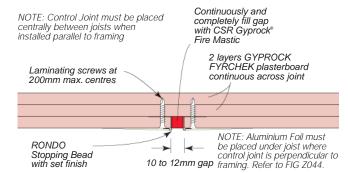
CONTROL JOINT PARALLEL TO TIMBER FRAMING – 2 LAYERS
